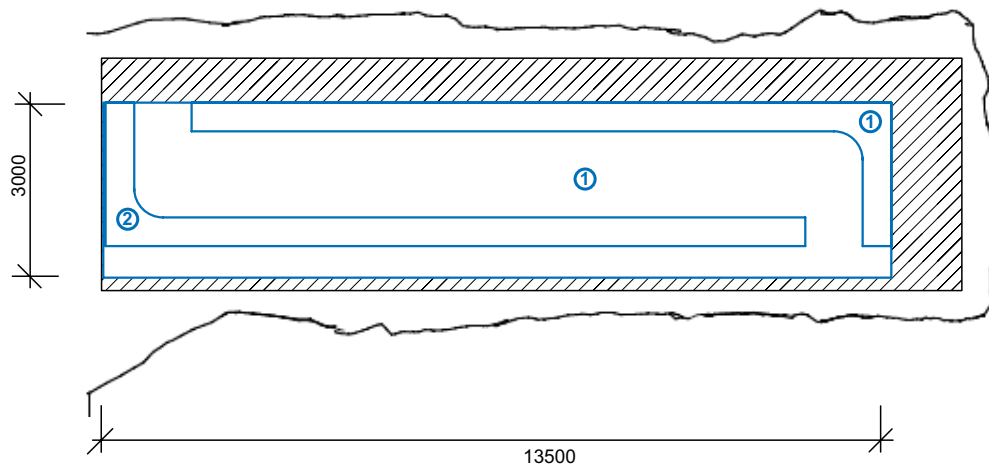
Section of components 1 and 2 with a 3 m wide base slab. All dimensions in mm.
